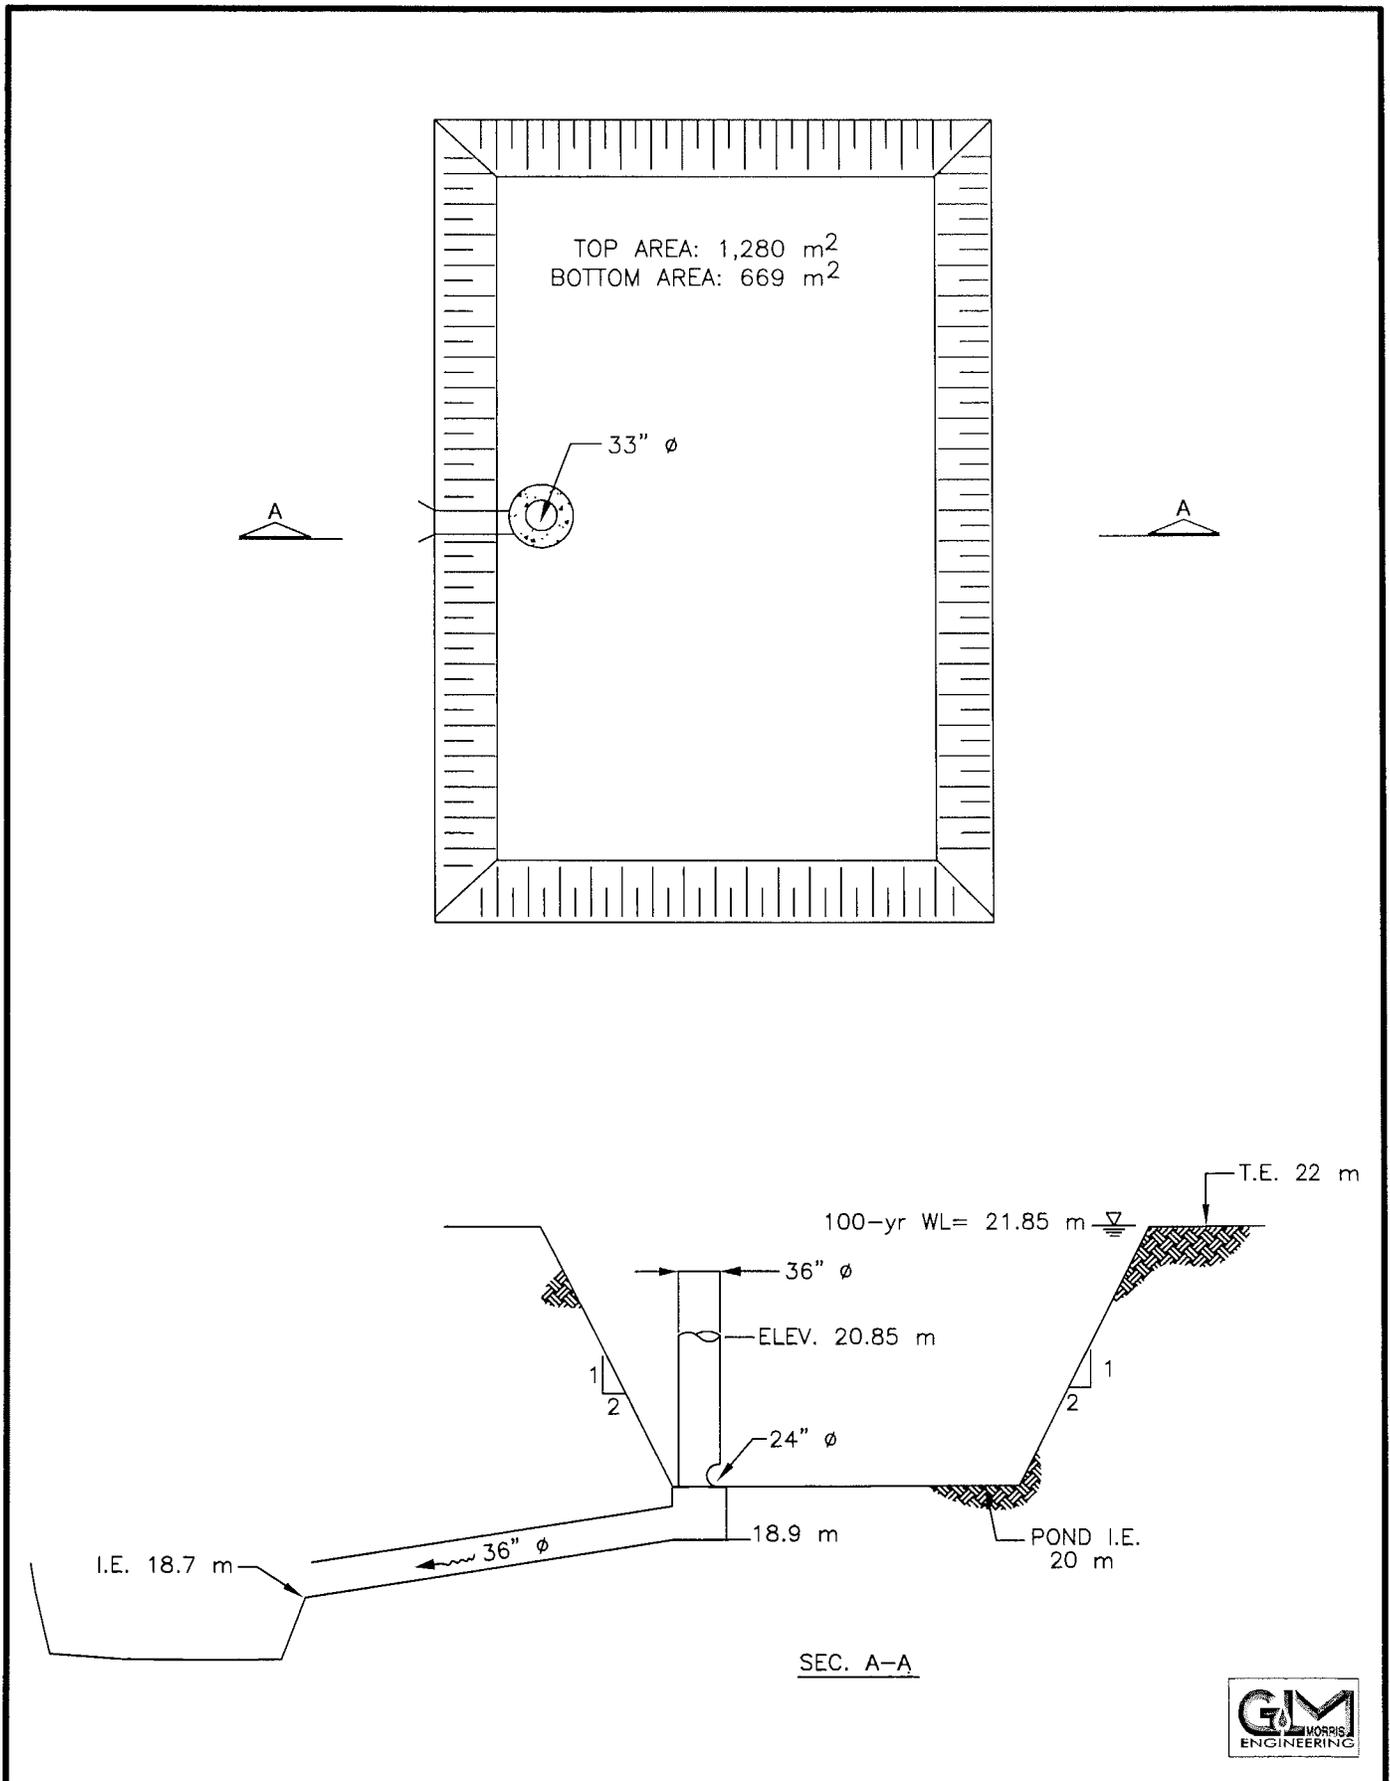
Schematic drawing of proposed detention pond and outlet structure for "Pond NE"
